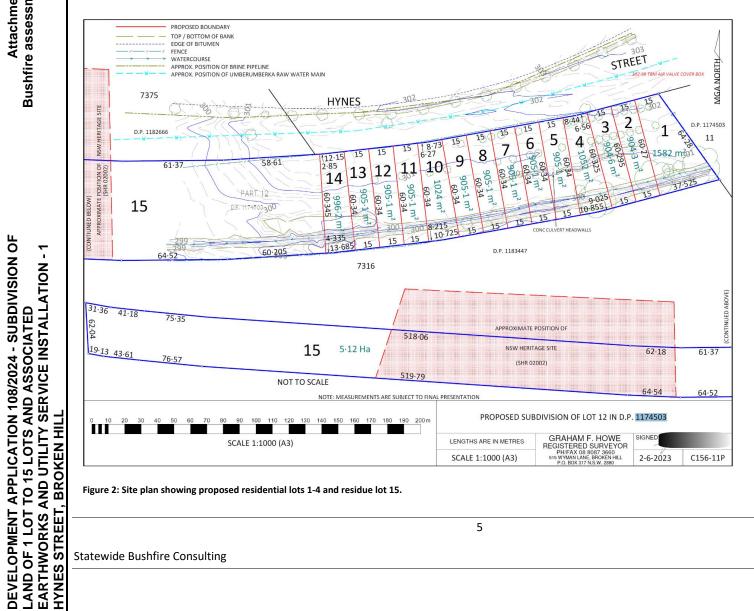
Site plan showing proposed residential lots 1-4 and residue lot 15.
